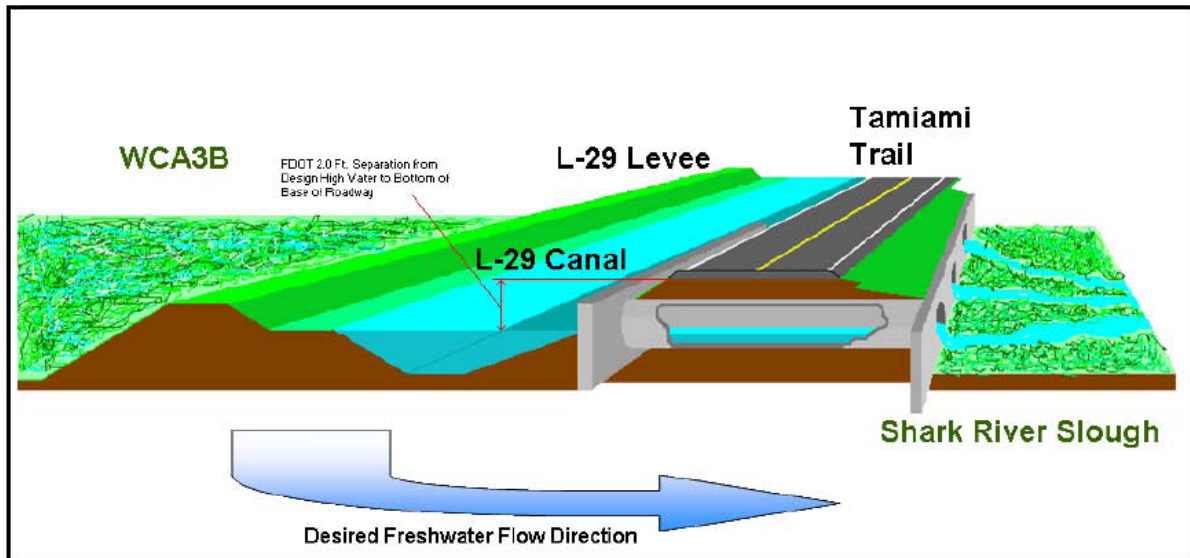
CROSS-SECTION OF TAMIAMI TRAIL WITH REINFORCED ROADWAY
